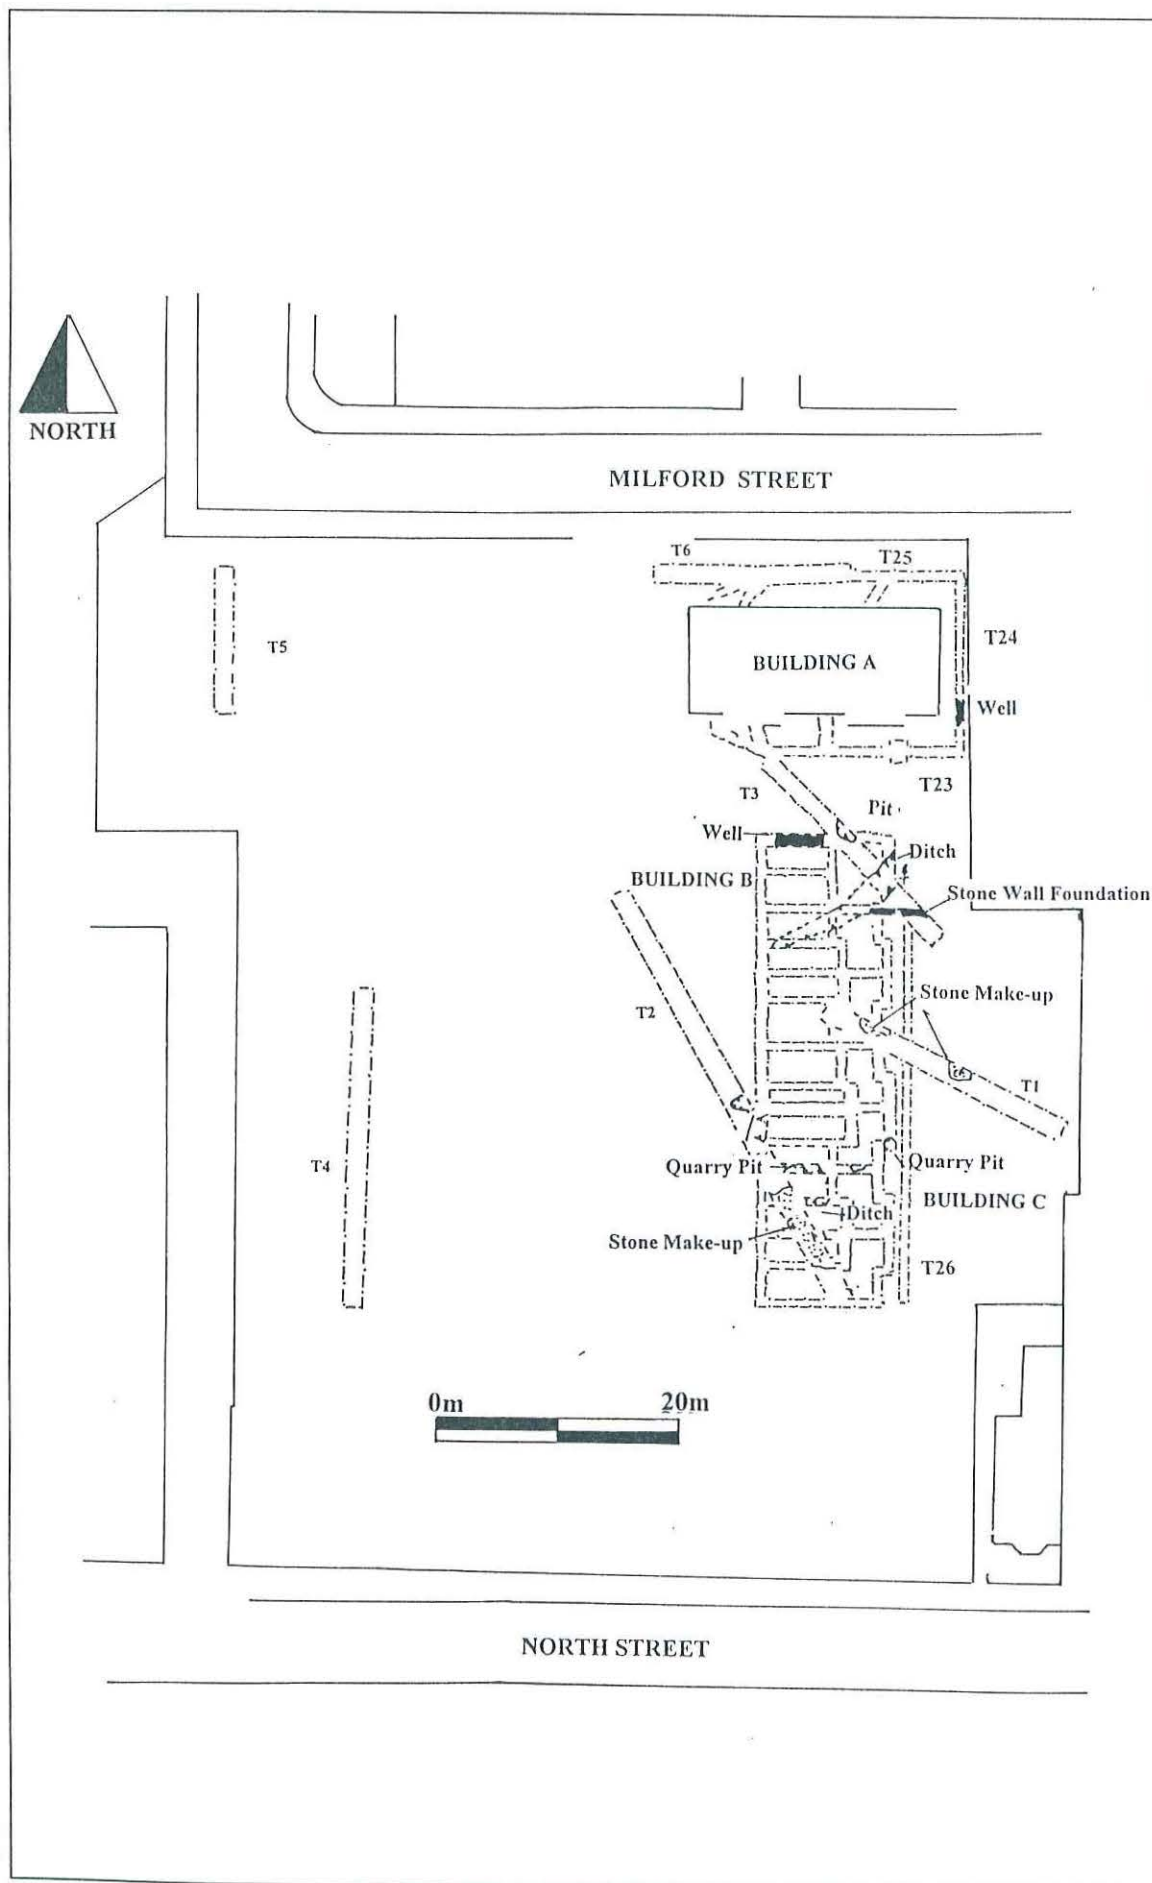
A location plan of the evaluation trenches and the foundation trenches of the new buildings and services.
